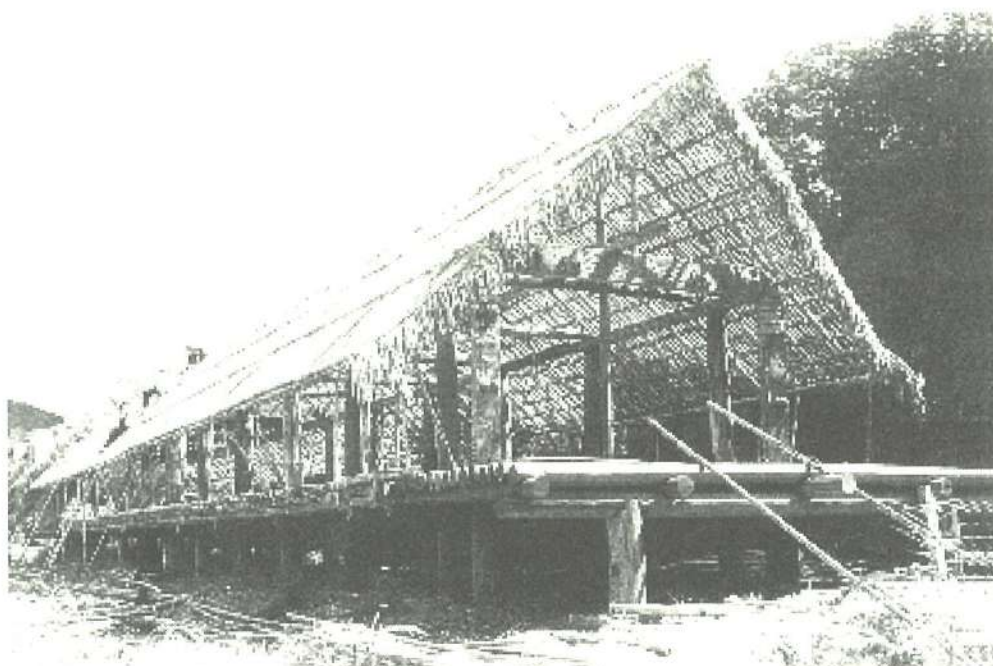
The E De traditional longhouse being erected (Vinaculto)
